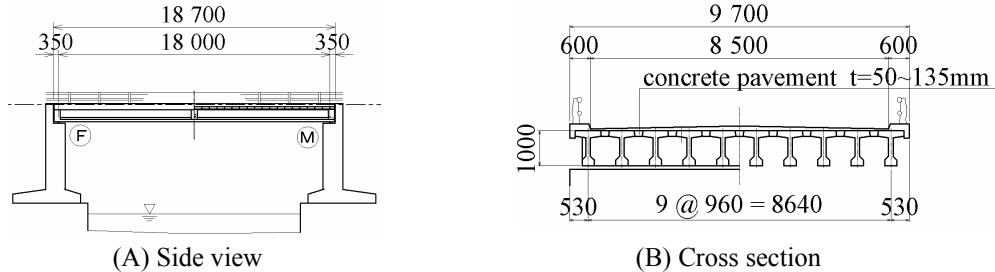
The studied bridge that is a PC T-girder bridge with a span of 18.0 m and a width of 8.50 m.
